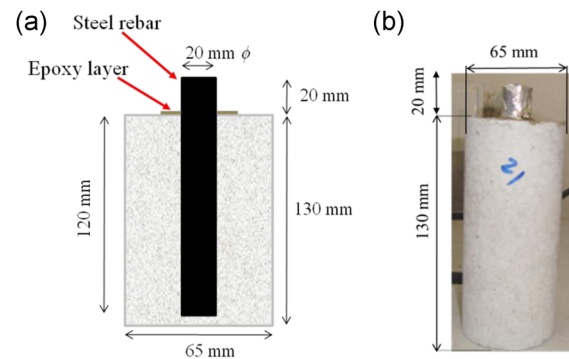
(a) Schematic of the sample geometry and (b) a concrete cylinder with embedded steel rebar [Color figure can be viewed at wileyonlinelibrary.com]
